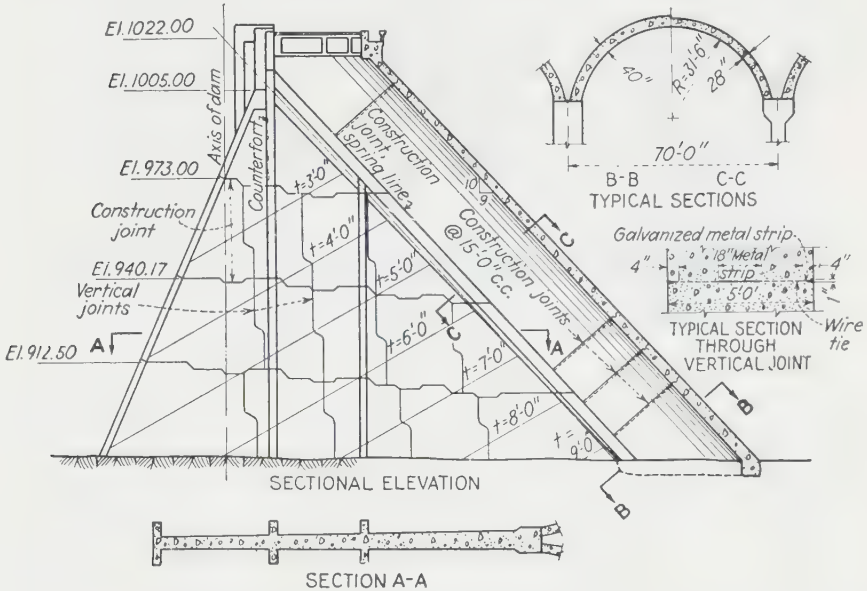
The Buchanan Dam. Buttress elevation and sections.
